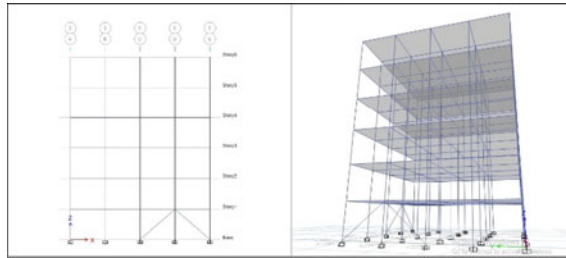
Bracing connecting with bottom beam – column junction of structurally “Weak” column for 0° angle slope
